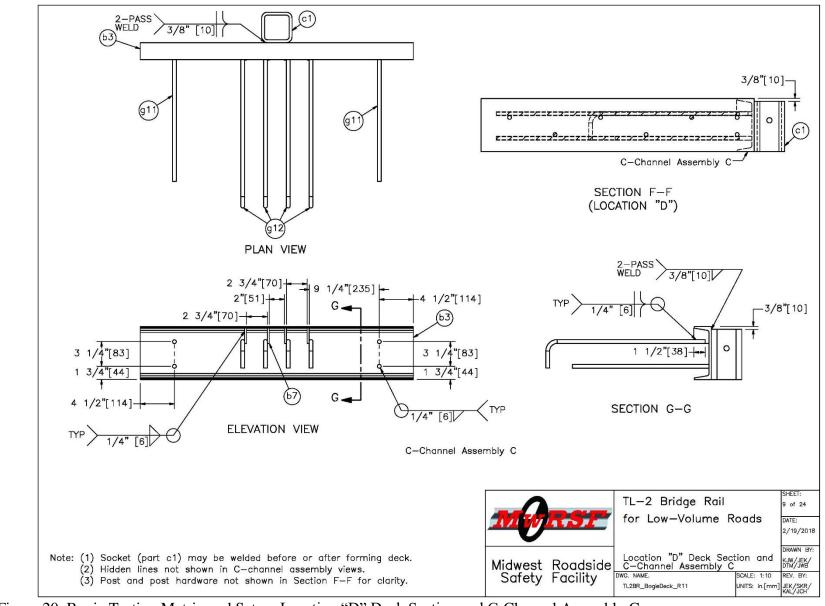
Bogie Testing Matrix and Setup, Location "D" Deck Section and C-Channel Assembly C
